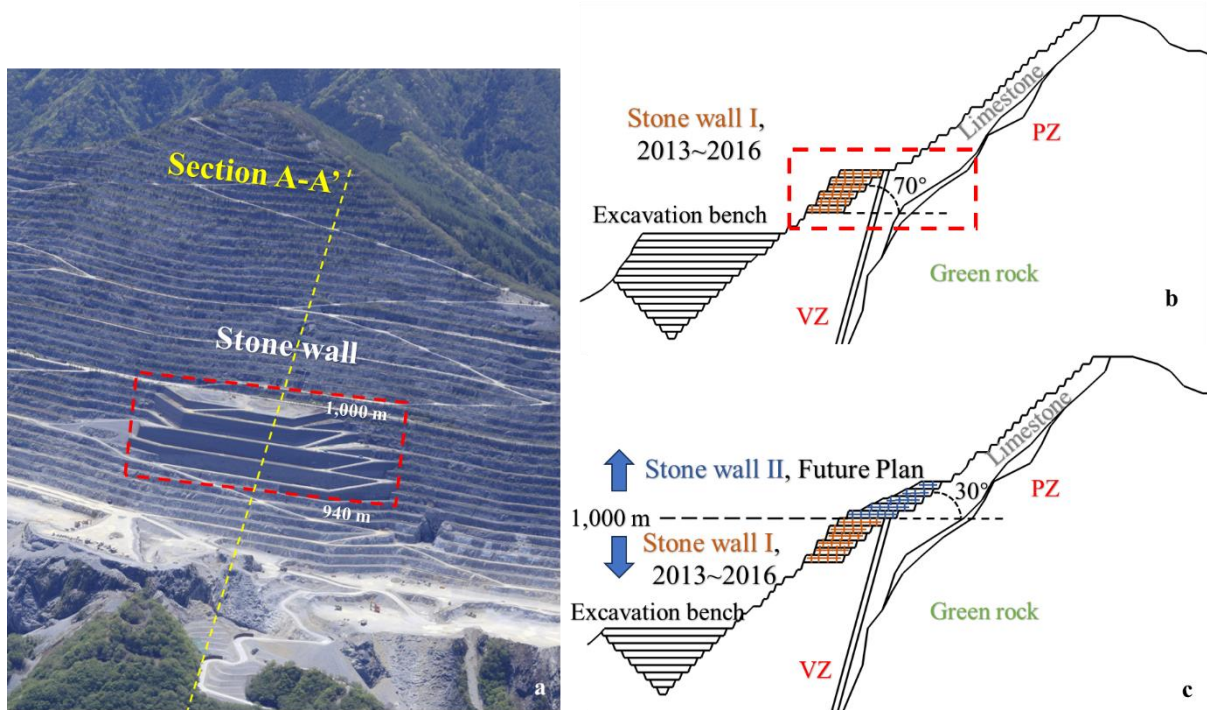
The Stone wall in Mt. Buko: (a) Location of the stone wall (b) section model of current stone wall (c) section model of planning stone wall.
